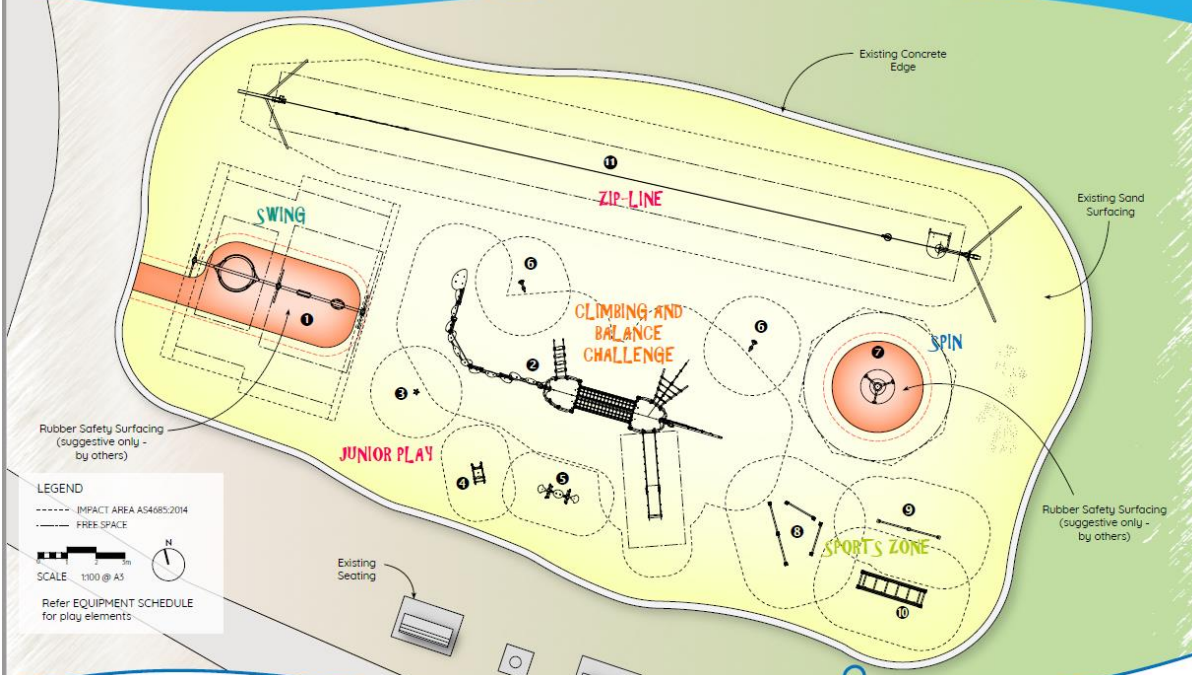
202 | EQUIPMENT SCHEDULE
